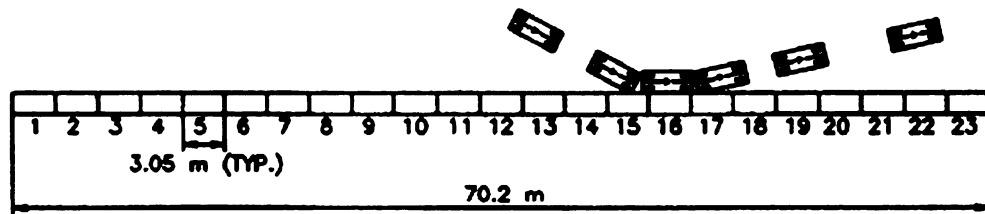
Demonstration of field test -plan view (NCHRP350 Report, 1993)
